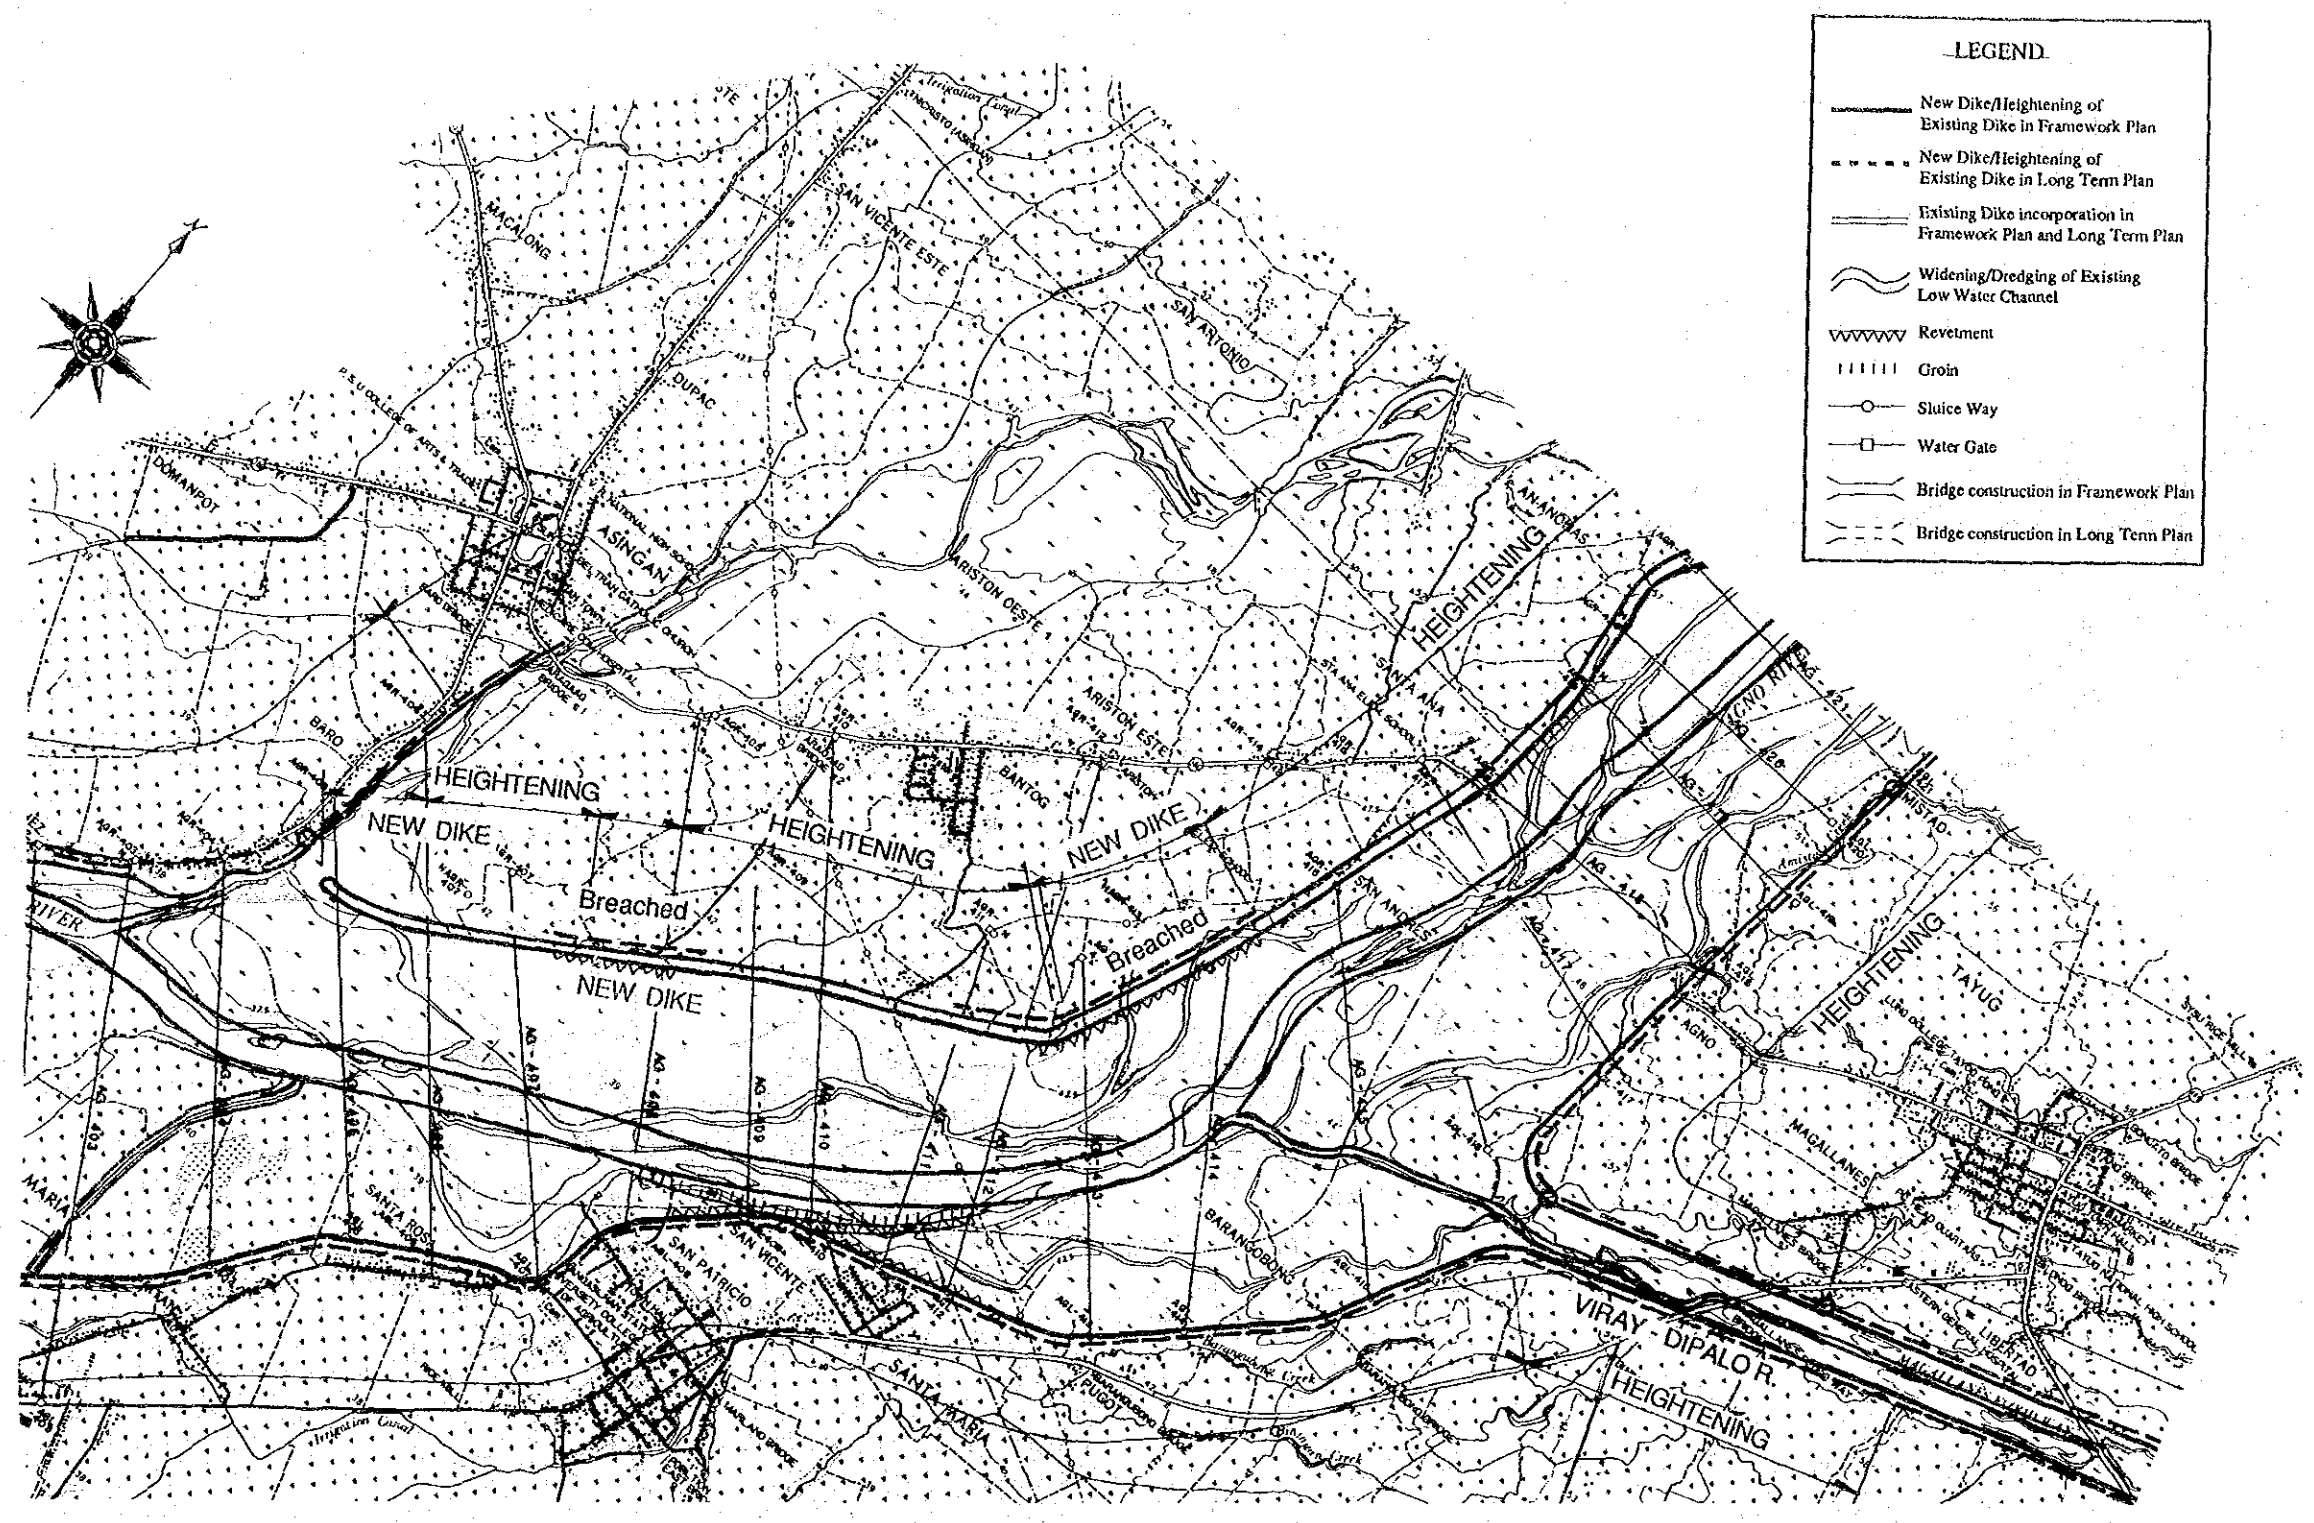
DESIGN PLAN OF AGNO RIVER (9/10)
